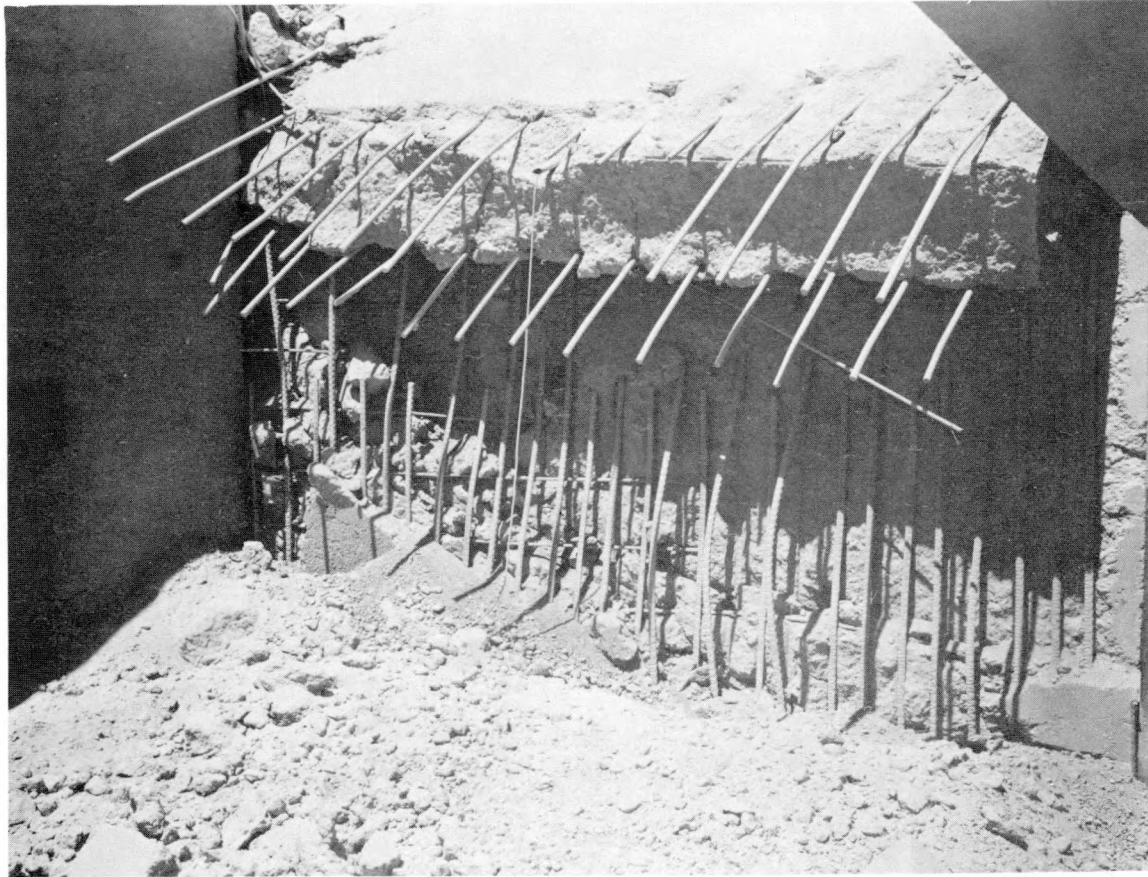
Detail of failure showing fractured bars (postshot).
